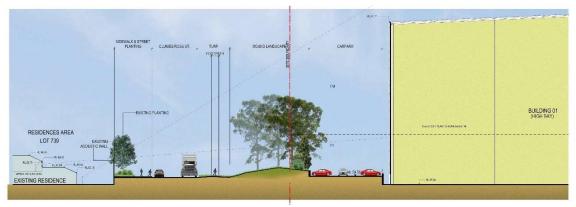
Landscape cross section - Warehouse 1 (Source: Habit8)
